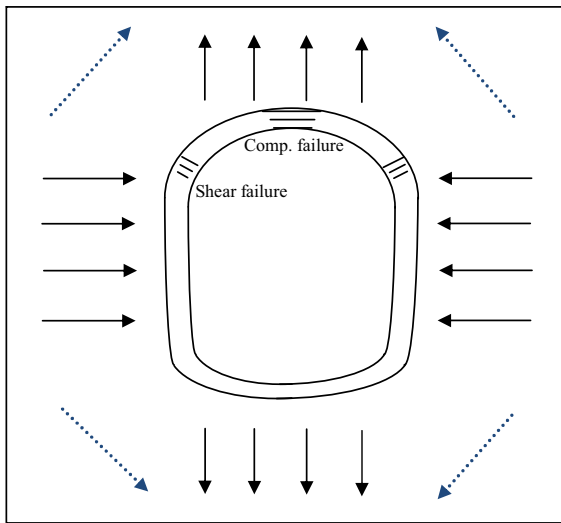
Mechanism of compressive and shear failure of tunnel lining
